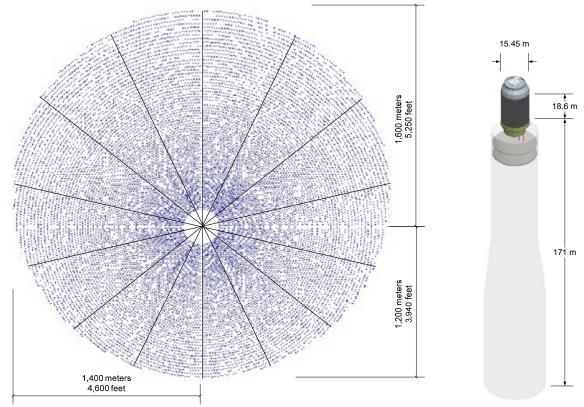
Typical Heliostats Field Layout and Tower Receiver
